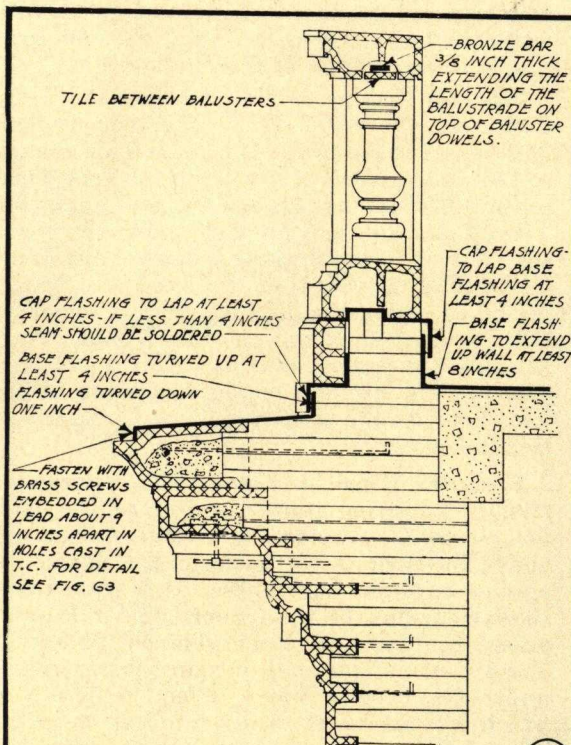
One method of flashing a Terra Cotta cornice is shown in Fig. 59. The cap flashing on the outside of the balustrade and the flashing above it extending through the wall are both built in as the masonry progresses. Before laying the upper flashing a key is formed by the mason to avoid the chance of a side slip in the balustrade after erection. This key may be formed either by setting two bricks on edge or by the use of concrete; its exact size and location is decided by the design. The copper flashing should be formed closely over the projection in one piece and wide enough so that it can extend entirely through the wall and be turned down on the inside far enough to lap the base flashing at least 4 inches, and turned down outside about $\frac{1}{2}$ inch over the Terra Cotta to form a drip. The lower cap flashing, also built in with the masonry, turns up against the brick work back of the Terra Cotta at least 3 inches and down outside on the face of the wall far enough to lap the cornice flashing at least 4 inches. If the lap is to be soldered the distance may be reduced accordingly. The outer edge of the Terra Cotta cornice should be so designed as to provide a fastening for the outer edge of the copper base flashing covering the top of the cornice. (A good description of the method of fastening is given in Fig. 63.)
